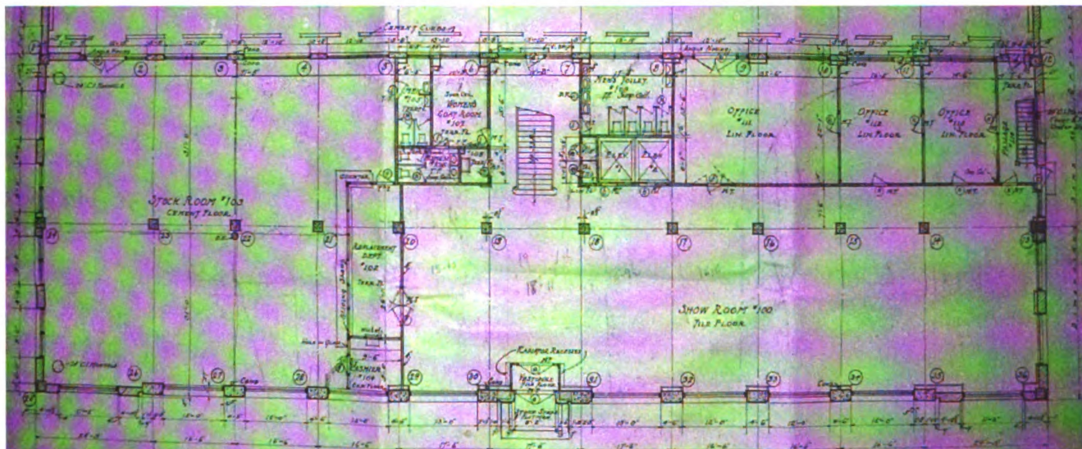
Detail of the floor plan for the first story of the sales building. Courtesy of Albert Kahn Inc.
